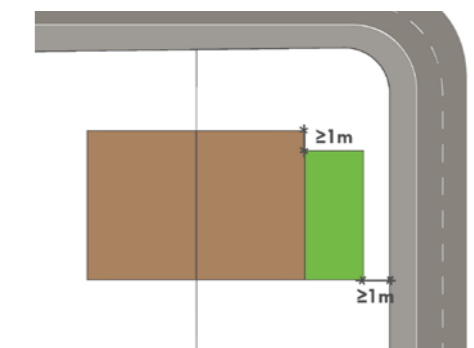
Corner plots extensions will need to be set in by 1m from the boundary and main front wall of the house
